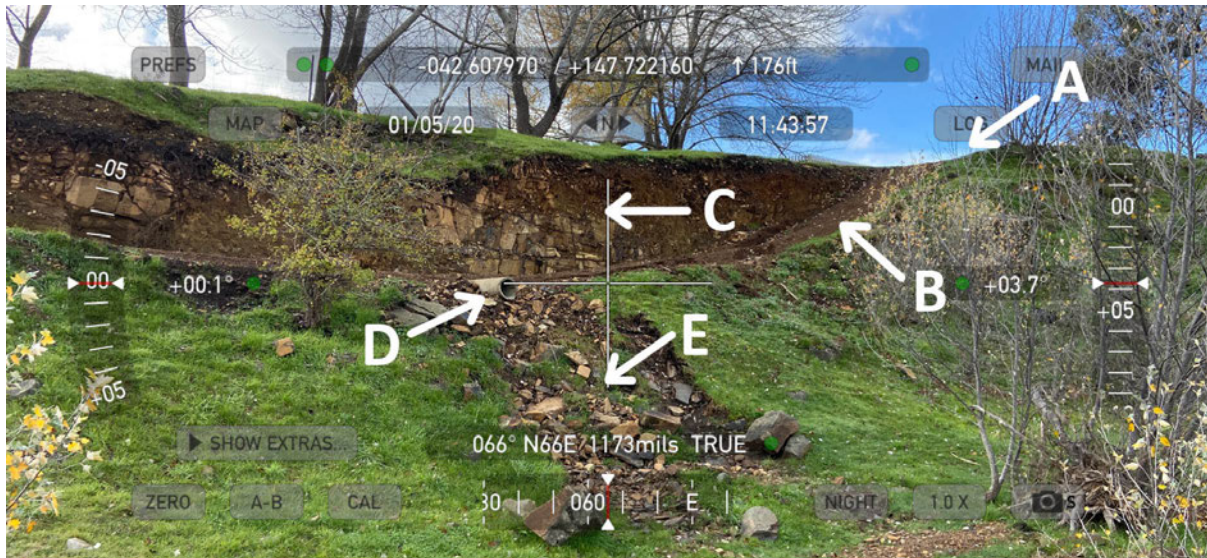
Walking Track works along the southern boundary of lot 60 Kent Street.
